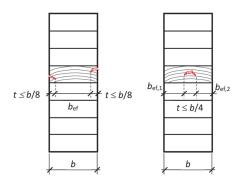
Shrinkage cracks measurable from the side faces (left) and inner cracks (detectable on the end grain) (right) in a glulam cross-section
